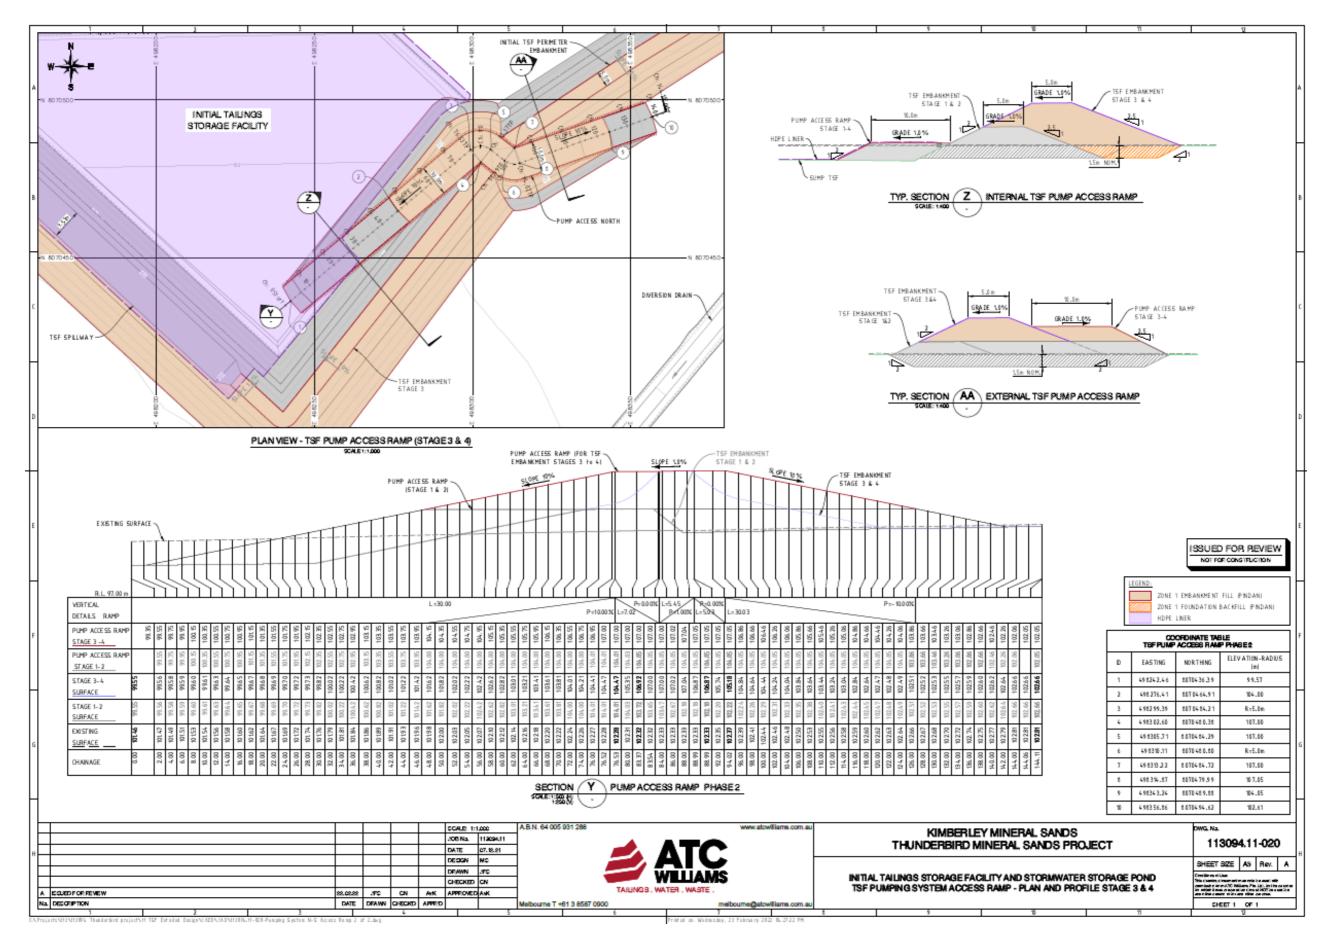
Drawing – Initial TSF and SPP, TSF pumping system and access ramp, plan and profile stages 3 and 4
